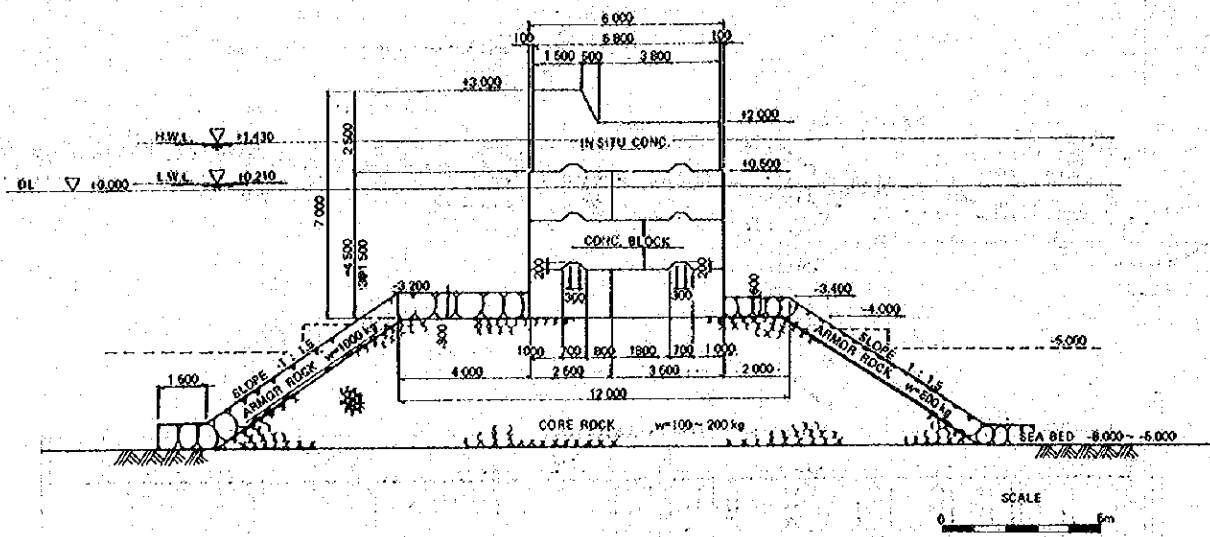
Cross Section of Breakwater (4) - Lucena Port
